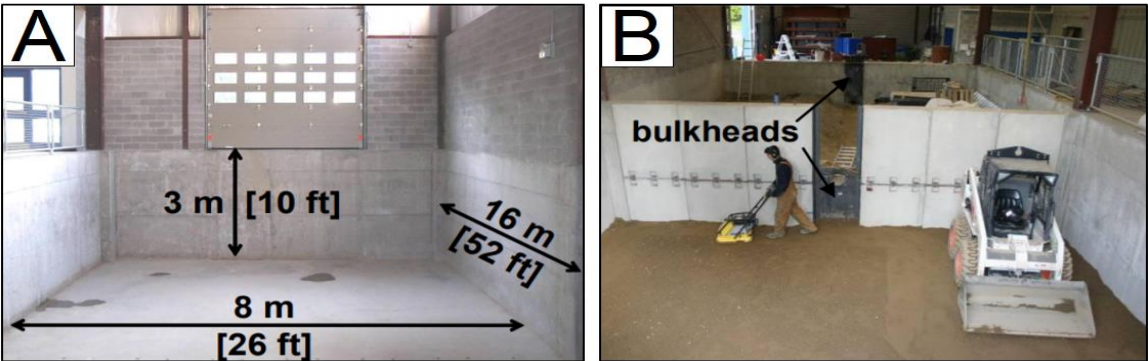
The test pit at Queens university, showing A) Geometric properties of the pit and B) construction of the foundation
